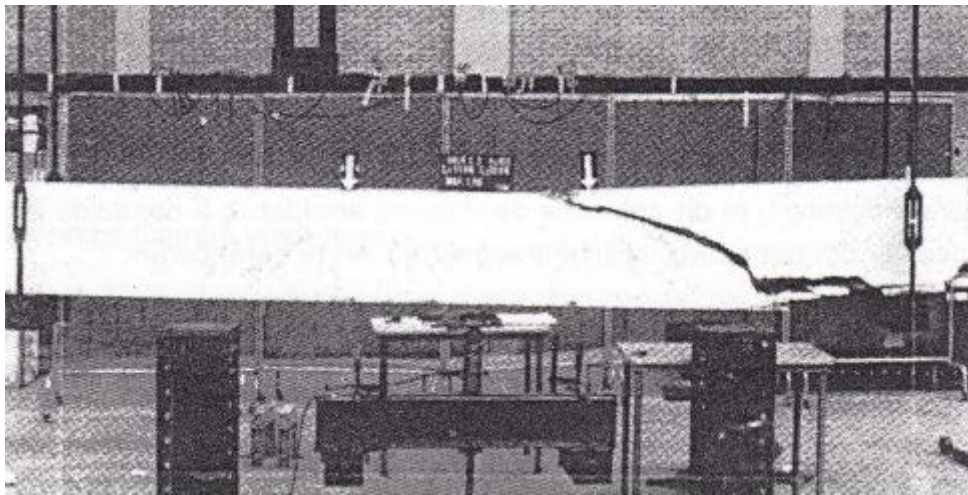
Brittle flexural shearing of beam without shear reinforcement
